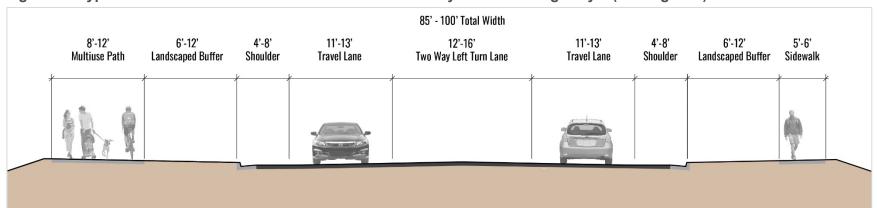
Typical Section for E. 88th Avenue between Rosemary Street and Highway 2 (looking east)
